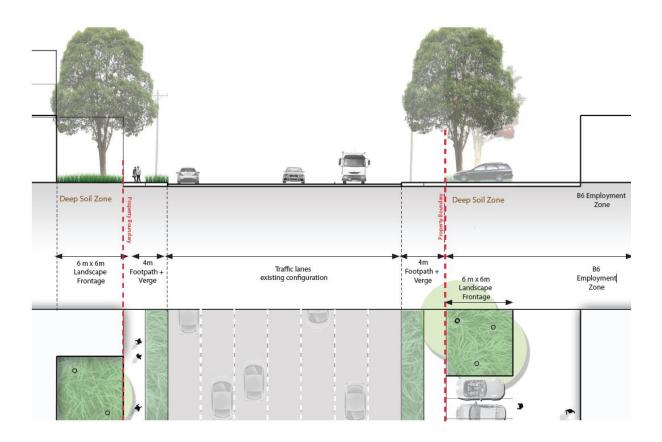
Indicative Section and Plan of Intermittent planting along the Princes Highway in the Banksia Precinct
